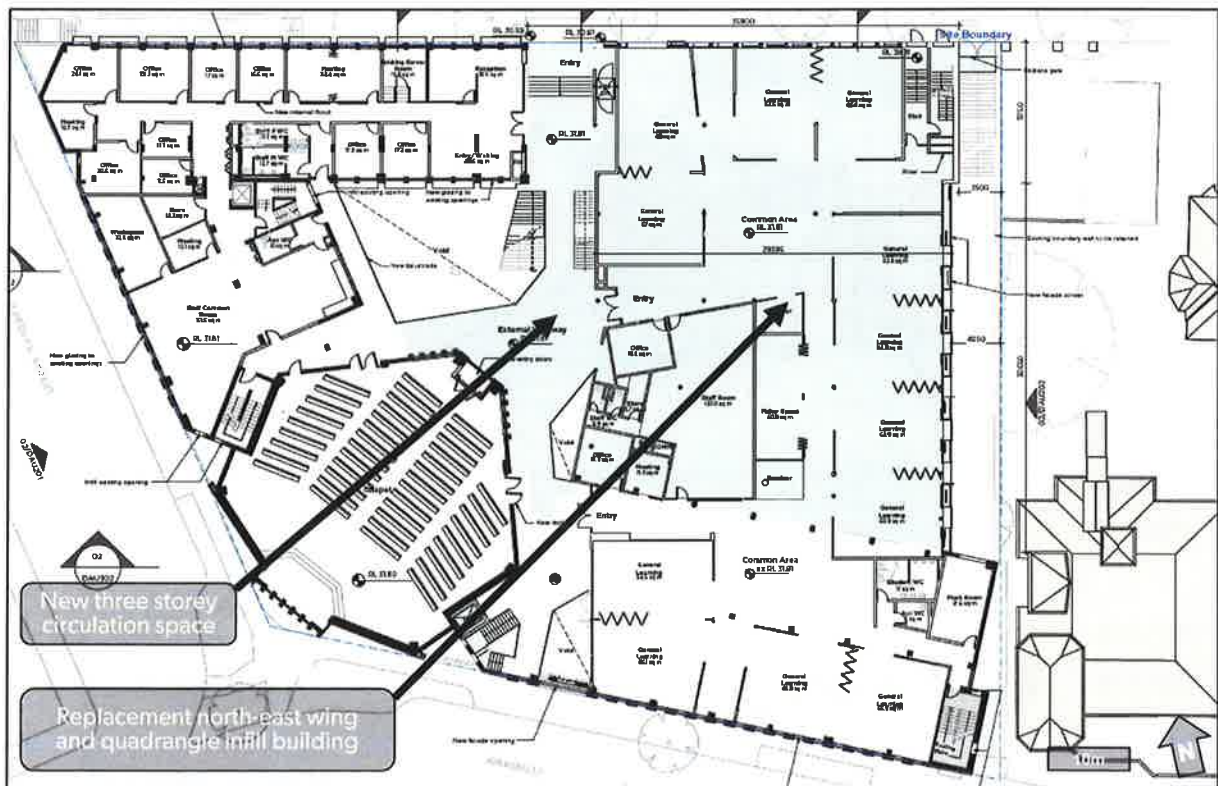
| Main Campus – Proposed Level 1 Layout (Source: Applicant’s EIS 2018)
